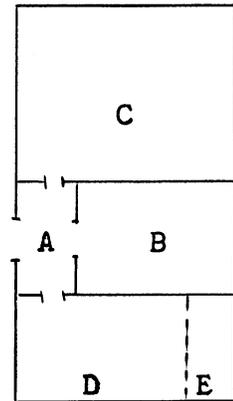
Floor Plan of Farmhouse near Bjelovar, Croatia
